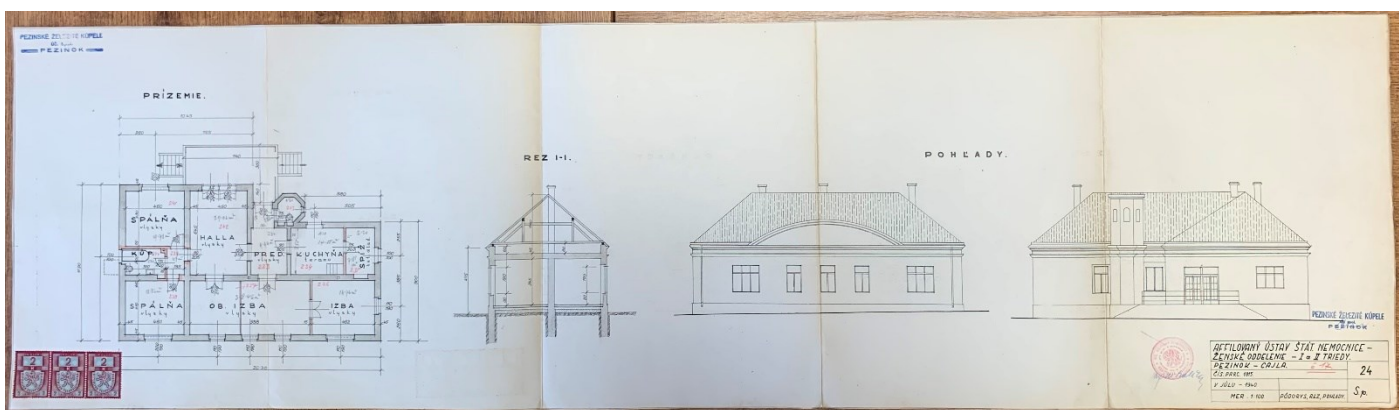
The Pezinok Institute for People with Nervous and Mental Health Disorders. Private female clients' pavilion. Left to right: Ground-floor plan, Cross-section, Elevations. (Source: State Archives in Bratislava, Slovakia, 1940)
